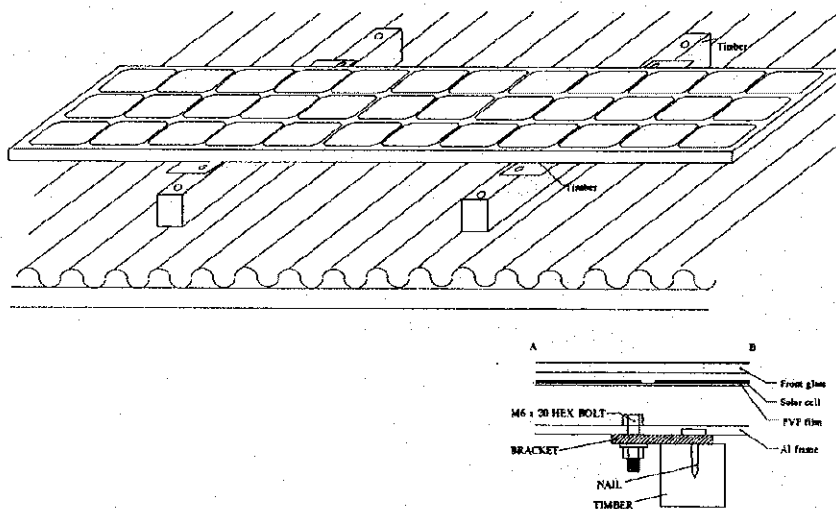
Drawing of roof mounted PV array2) Pole mount type
